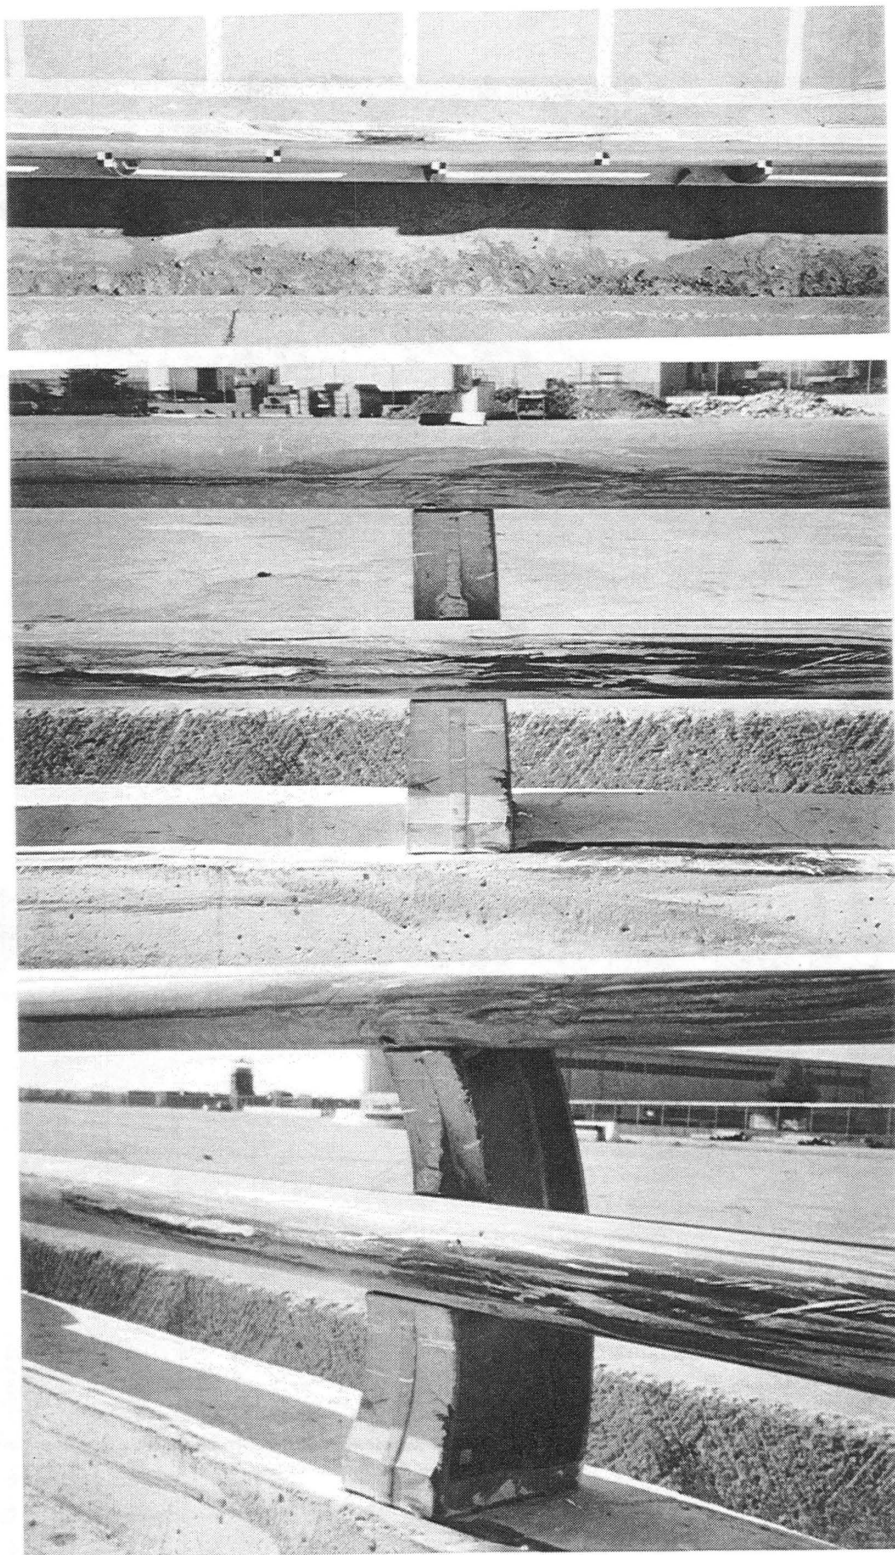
Bridge Rail Damage, Test FPAR-1.
